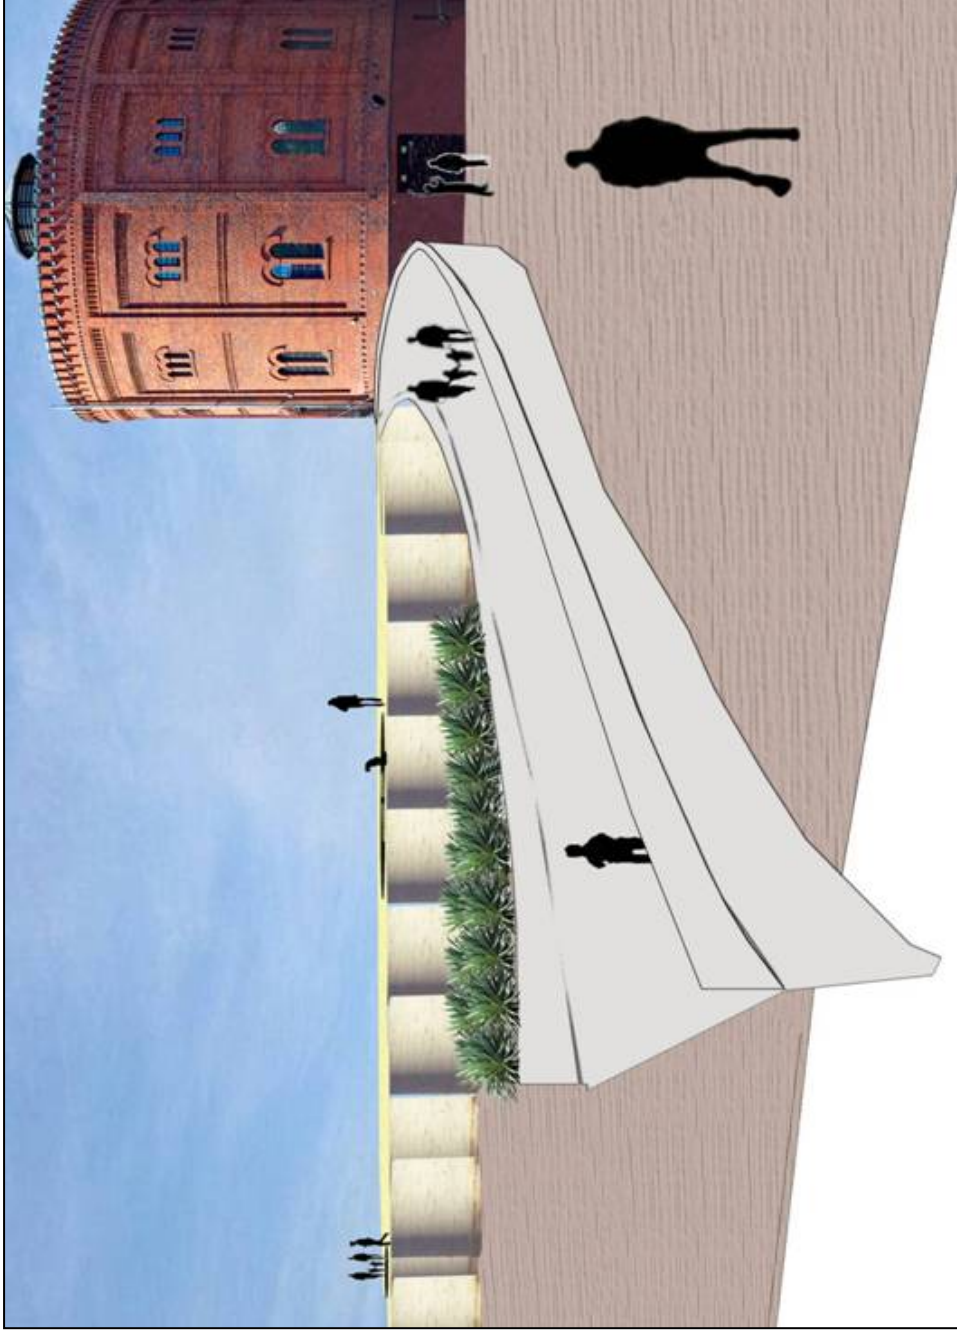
Stabilization / Solidification speculative projection. Site with raised concrete piers and a ramp leading to them is shown in the above figure. A gasometer like structure will be rebuilt where the gasometer stood before it was demolished and would be used as a space for indoor social interaction and recreation for the community.
